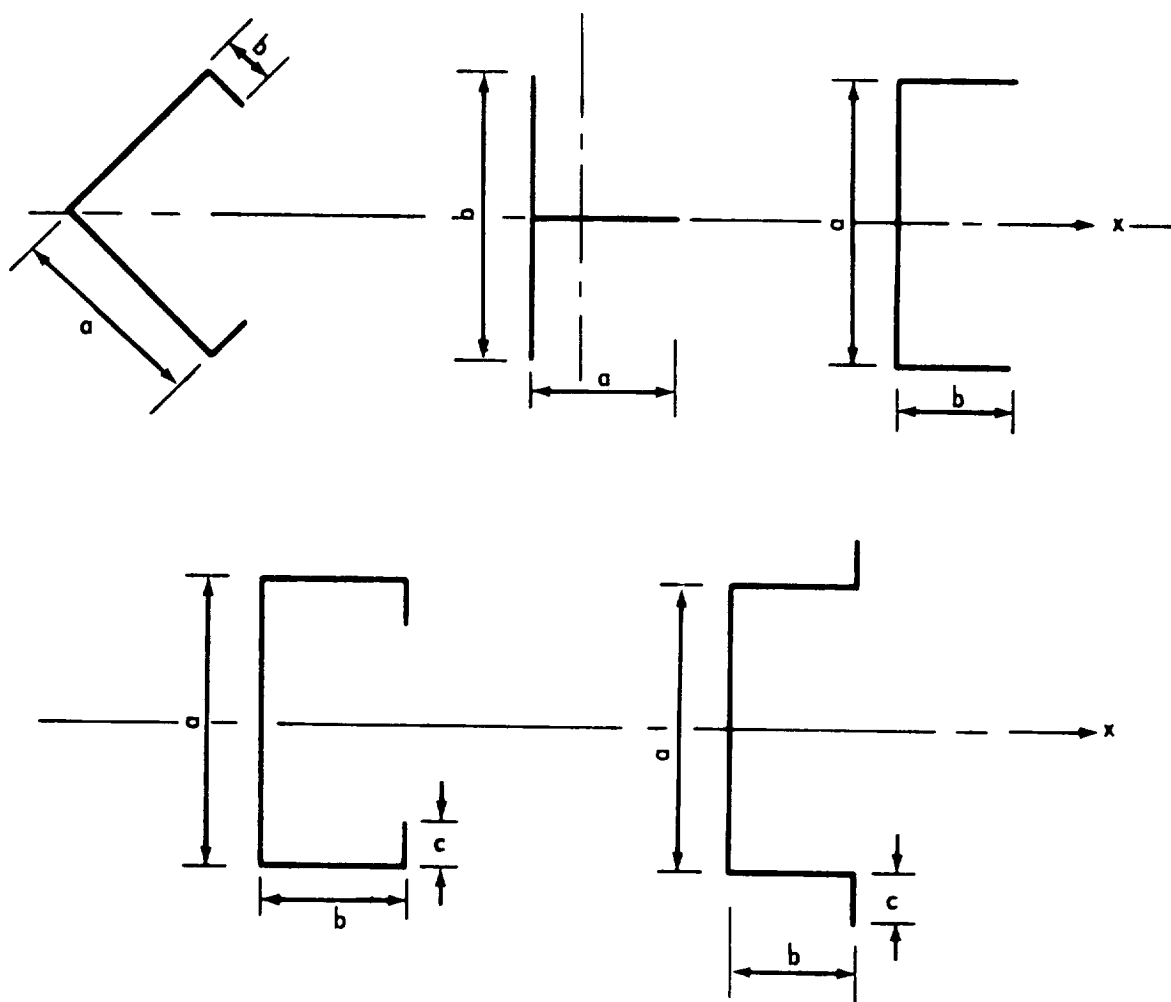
SINGLY SYMMETRICAL SECTIONS
